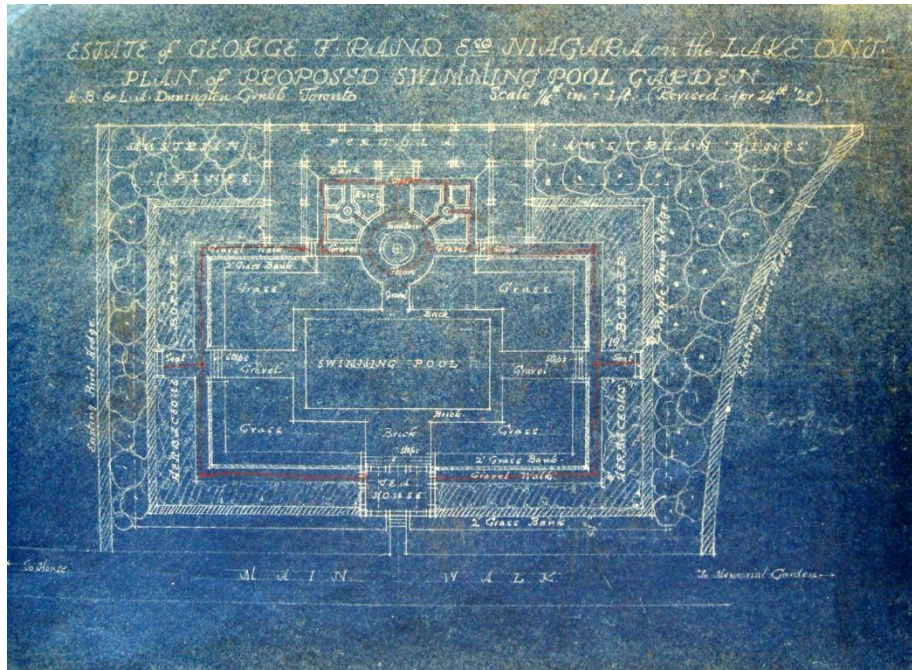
200 John Street, Designed Dunnington-Grubbe Landscape, Pool & Tea House Design, 1928
